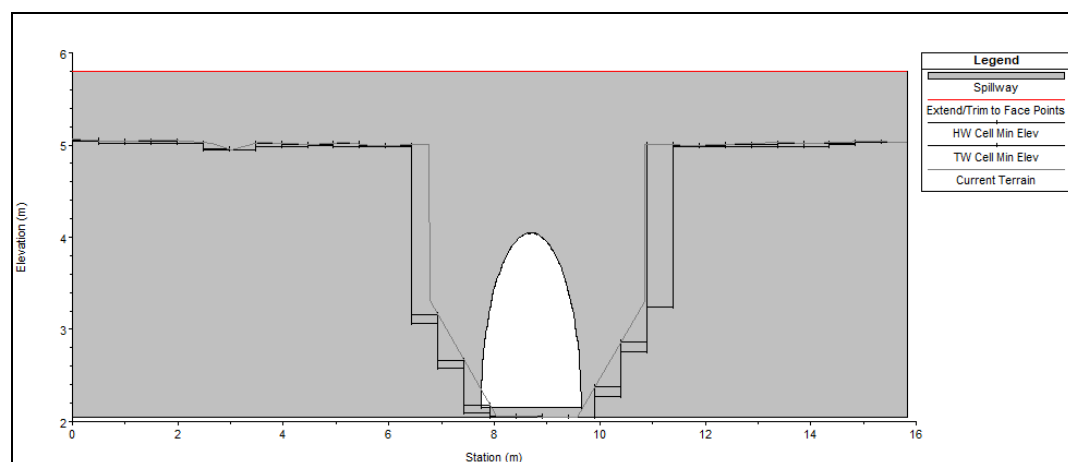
D HEC-RAS Structure – Downstream Bridge
